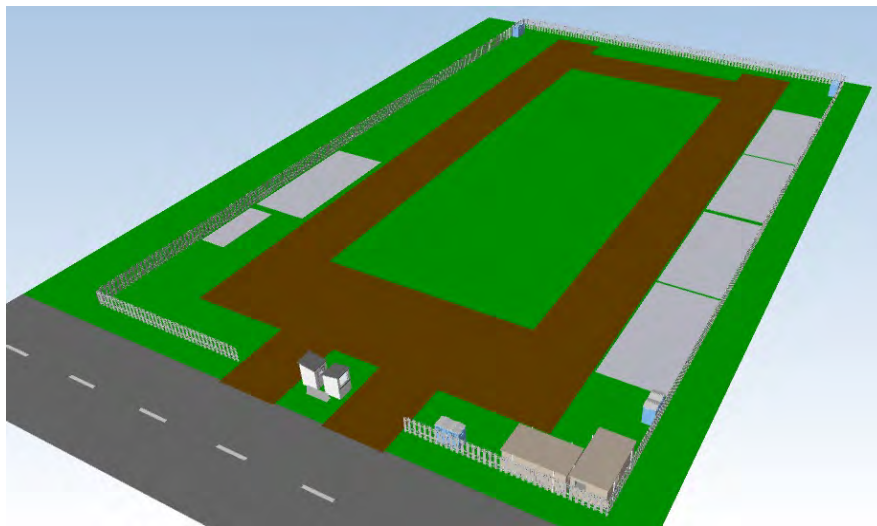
Positions of temporary facilities and storage spaces on the construction site
